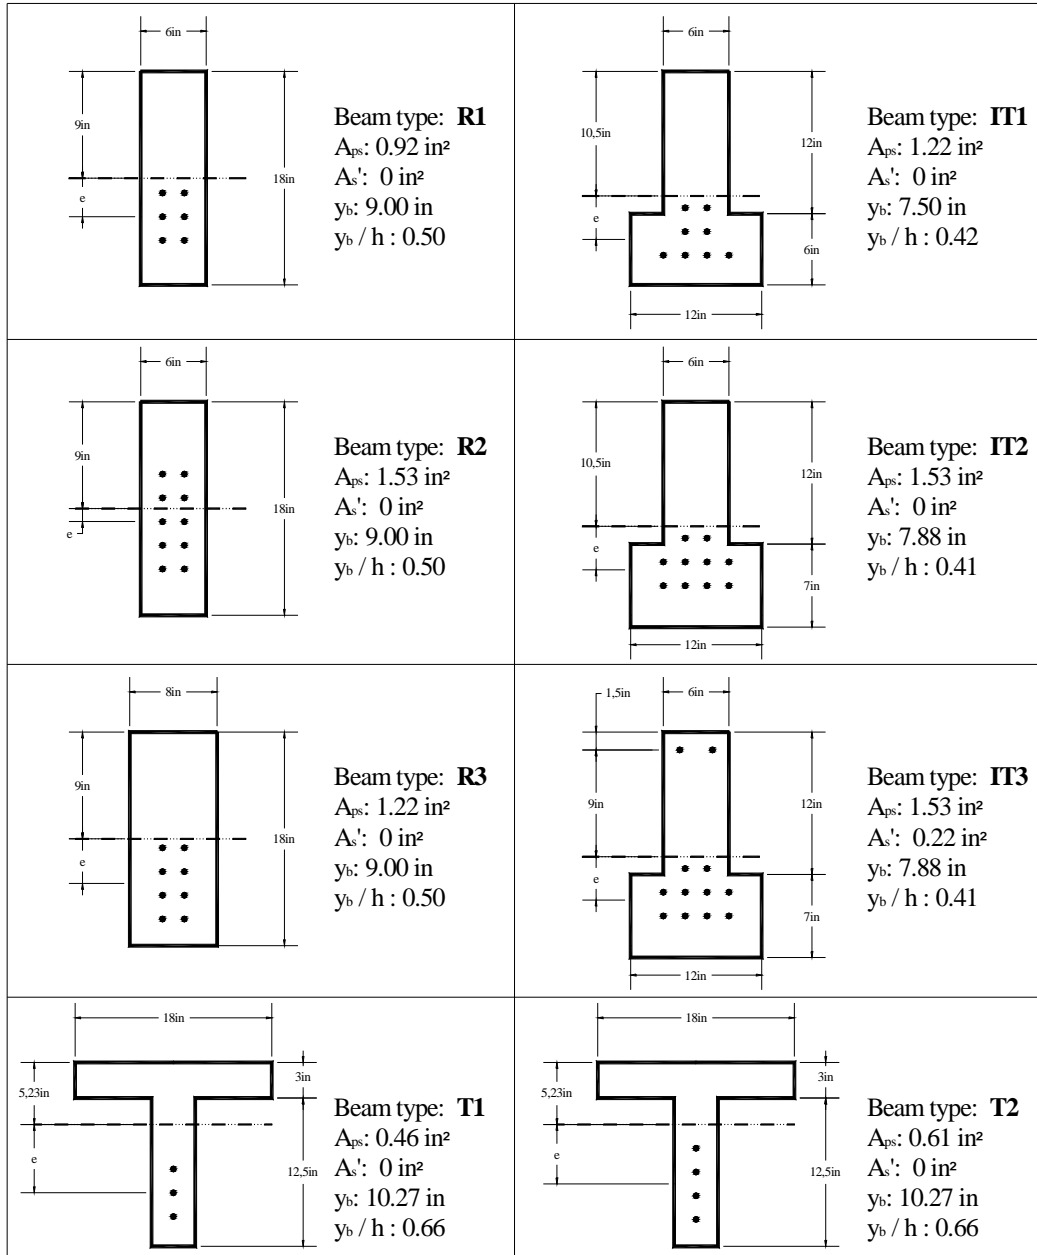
Small-scale test specimen cross sections (Castro et al., 2004)
